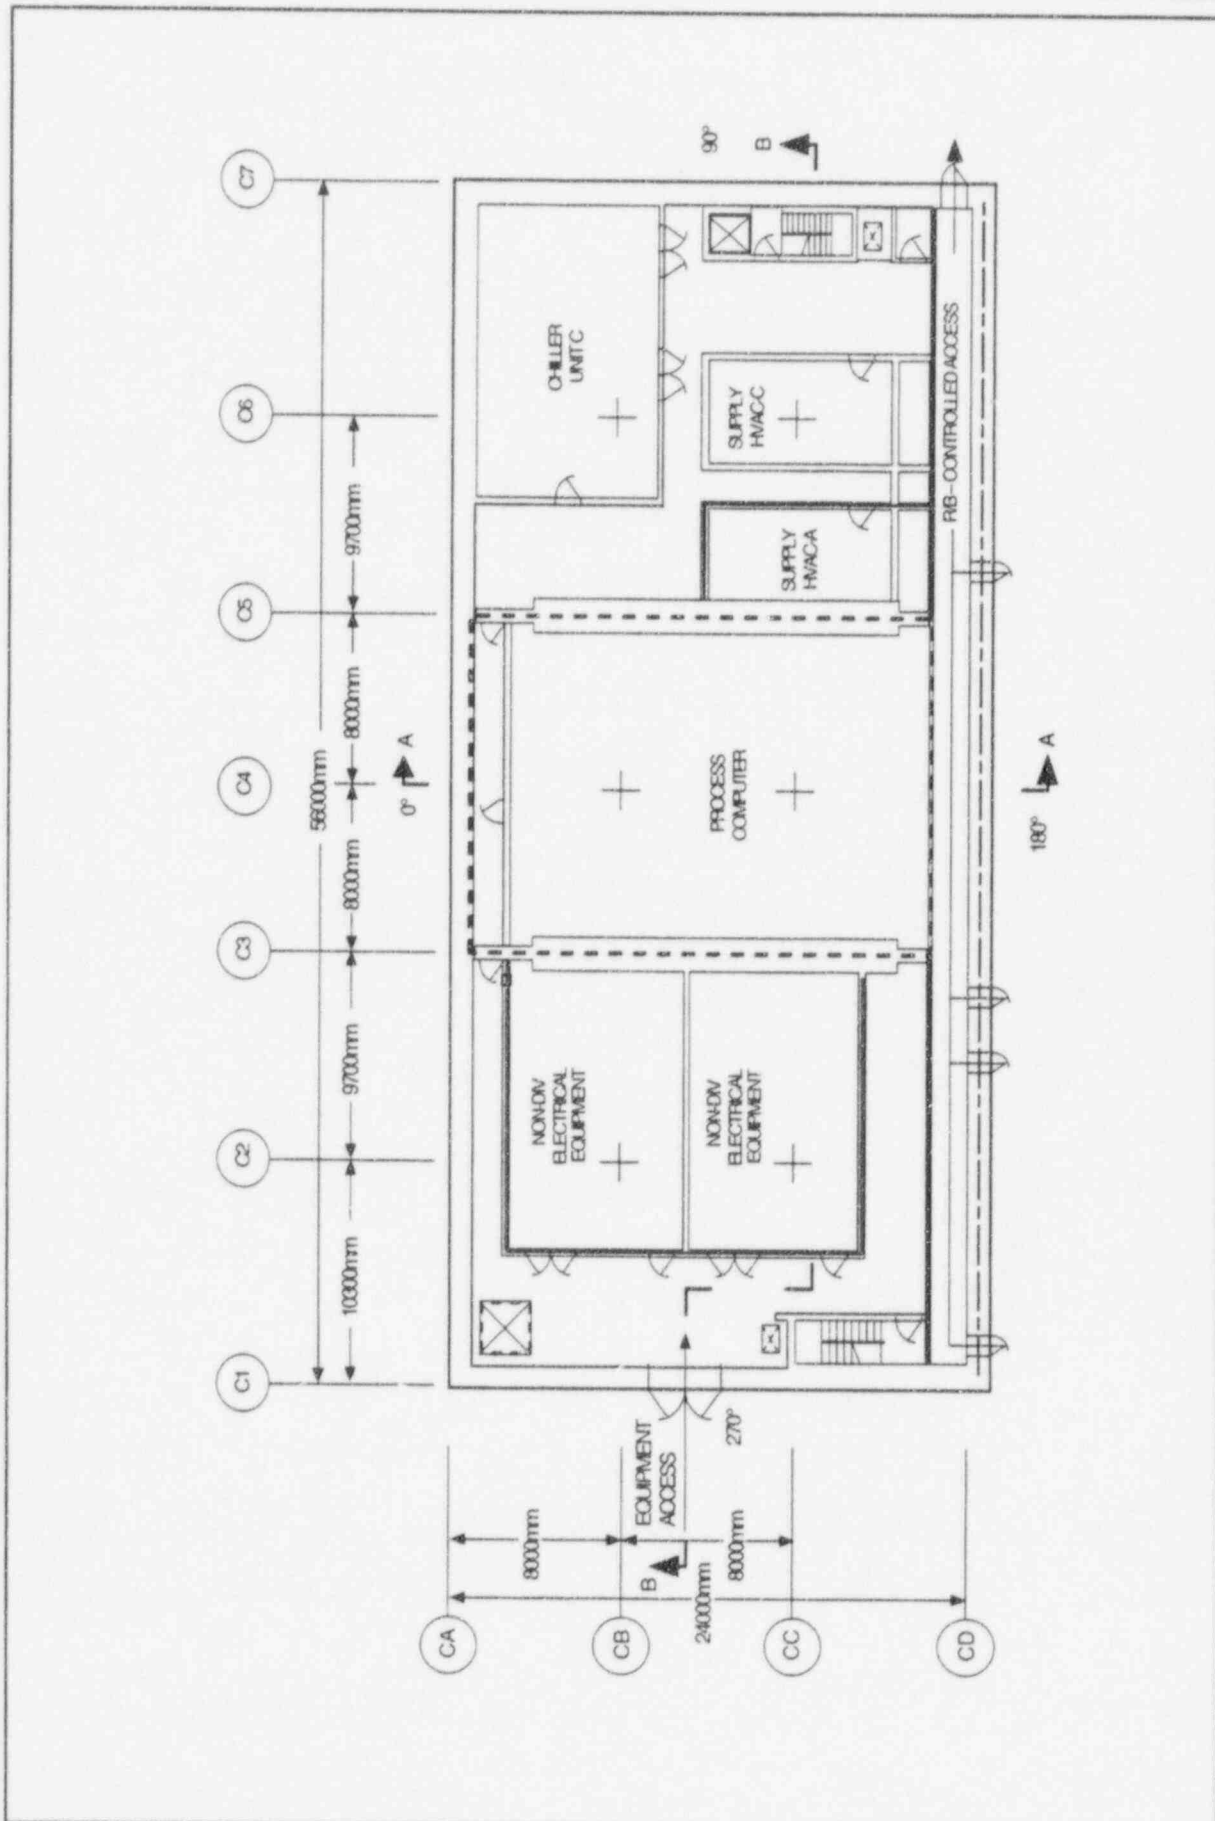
Control Building Arrangement, Floor 1F—Elevation 12300 mm
